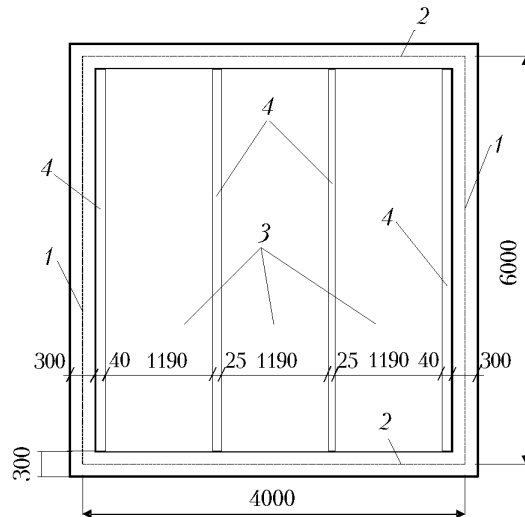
Disk-like floor of the precast-monolithic frame of a building: 1) bracing crossbar; 2) bearing crossbar; 3) multivoid slabs; 4) seams (dimensions in mm).
